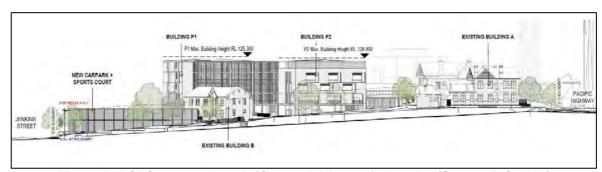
| CPS proposed south (Centennial Avenue) elevation (Source: RtS 2020)
